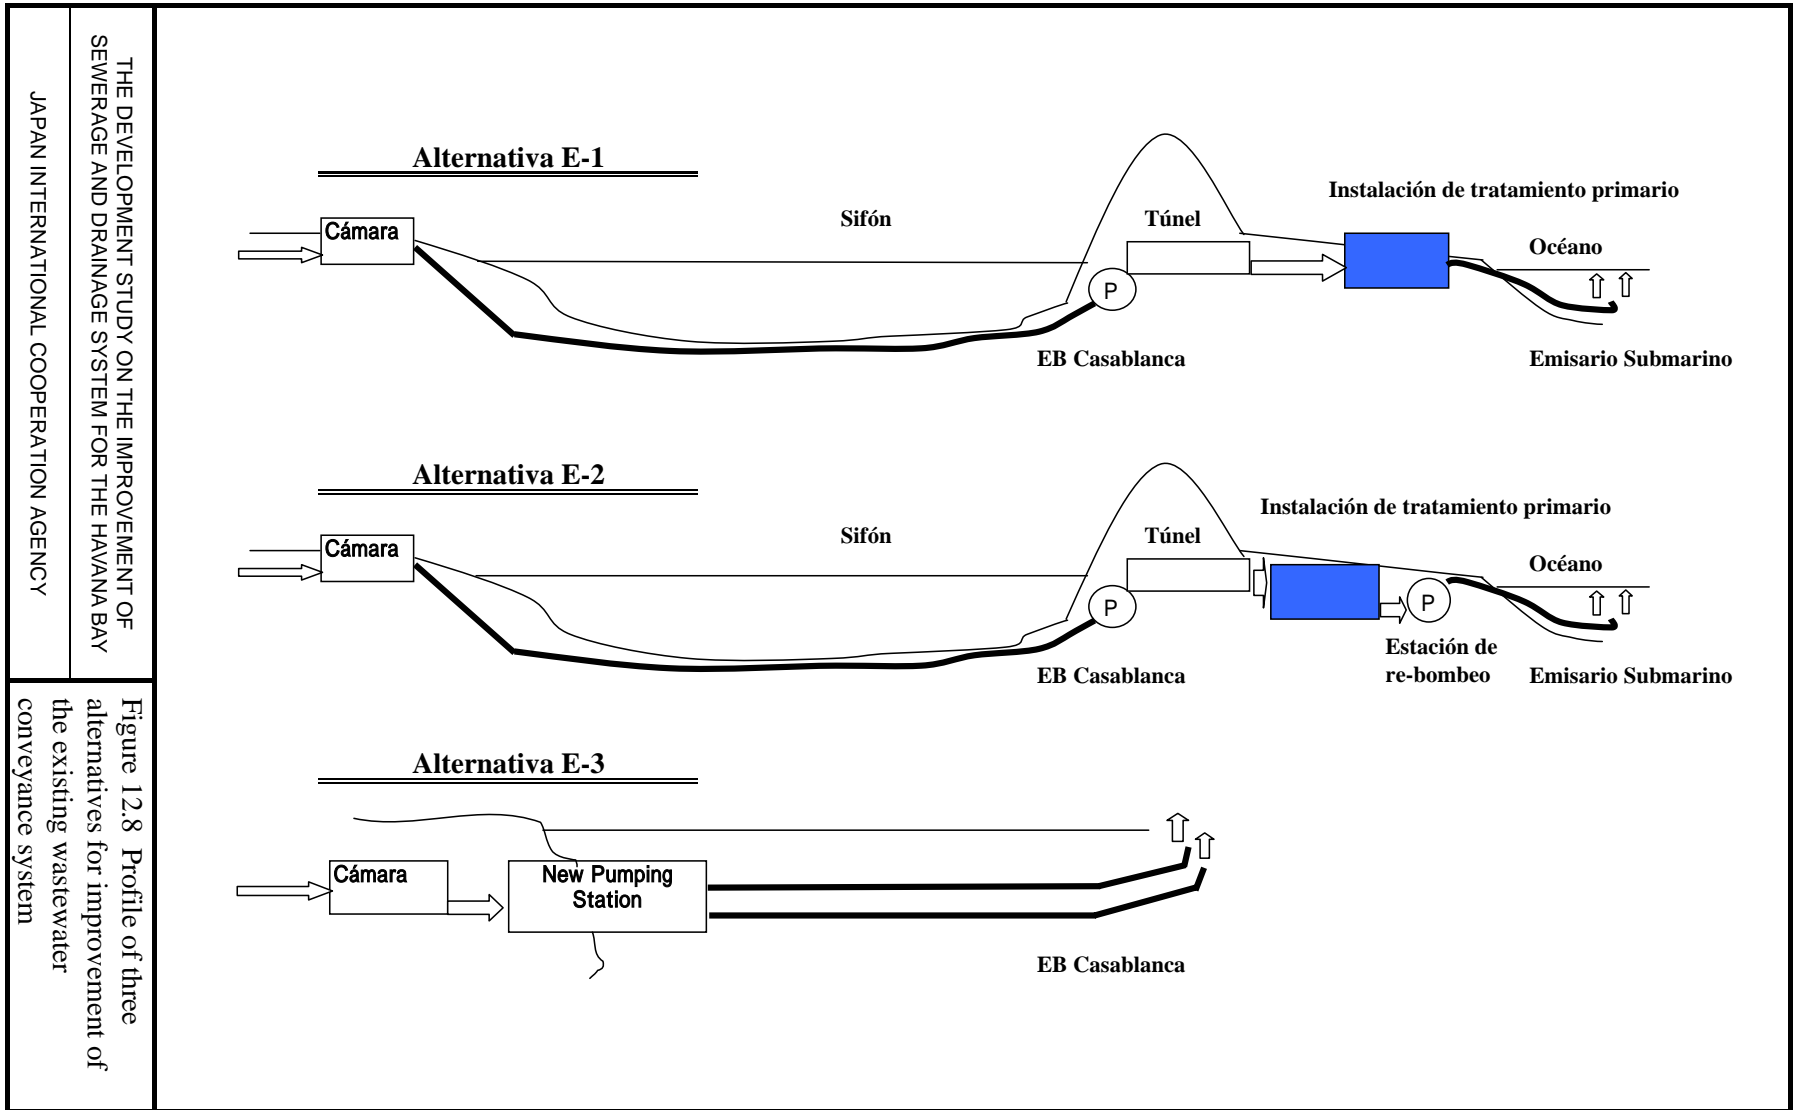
Profile of three alternatives for improvement of the existing wastewater conveyance system
